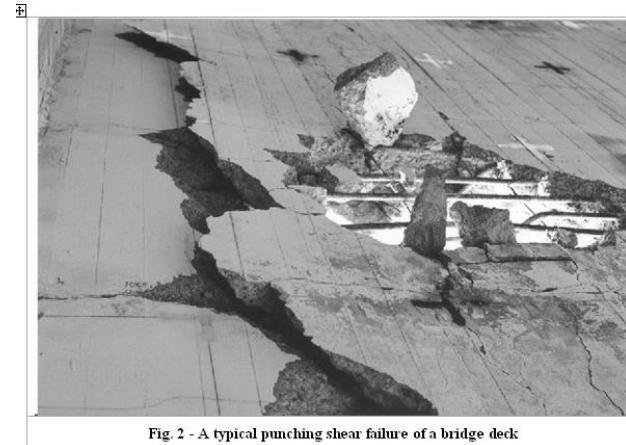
A typical punching shear failure of a bridge deck
